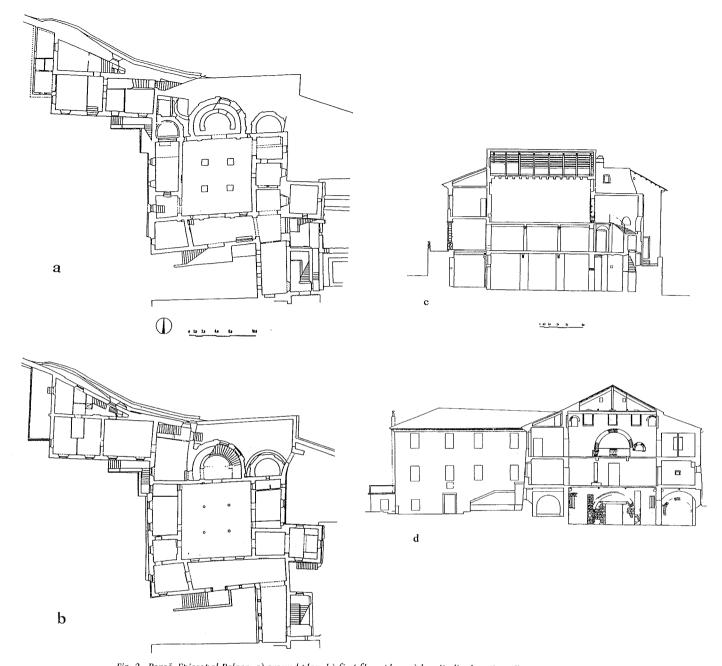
, Poreč, Episcopal Palace, a) ground plan; b) first floor plan; c) longitudinal section; d) transverse section
